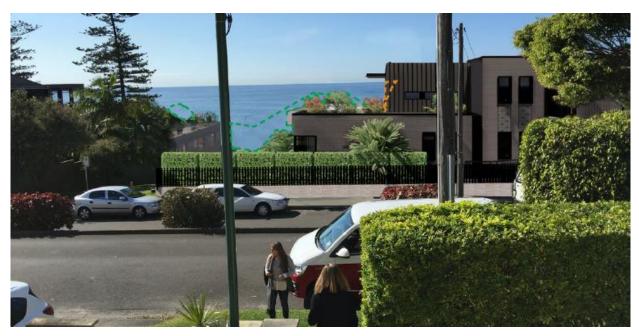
Proposed view from 30 Reddall Street, Ground Level Balcony (Source: Squillace Architects)
